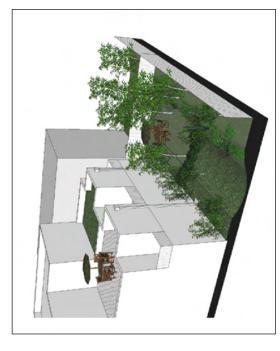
Minimize stormwater runoff to impermeable areas with landscaping, green roofs, and rain gardens when possible.
